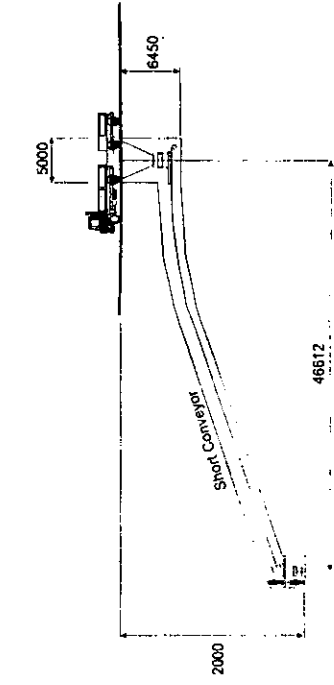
DETAILS OF CONVEYOR ROUTE AND TUNNEL
